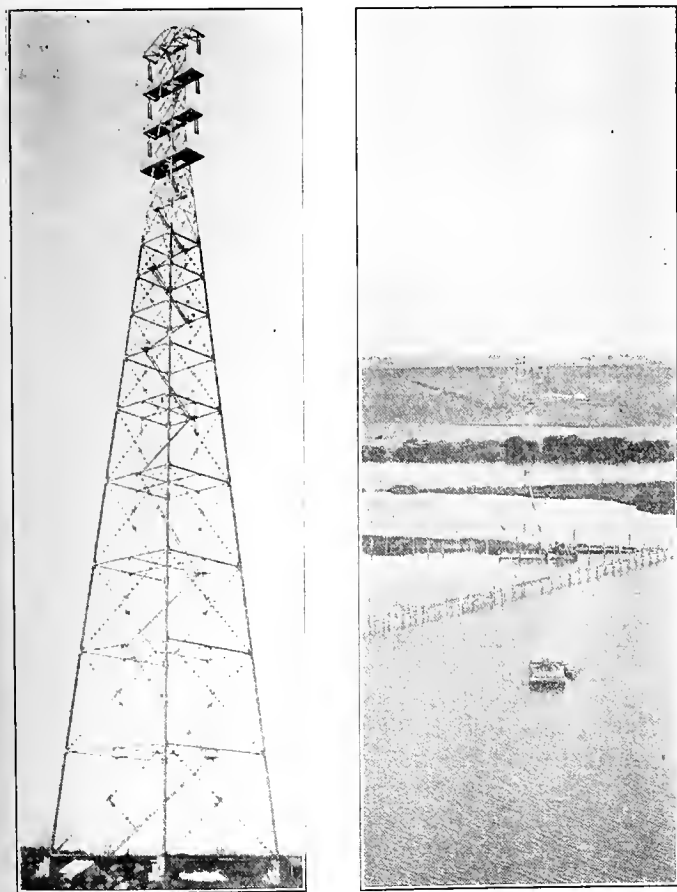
Completed high tower (left). Note comparative size of construction camp at base of tower. Looking north across the Sacramento from the high tower (right). Note obstructions that had to be crossed in stringing cables.
